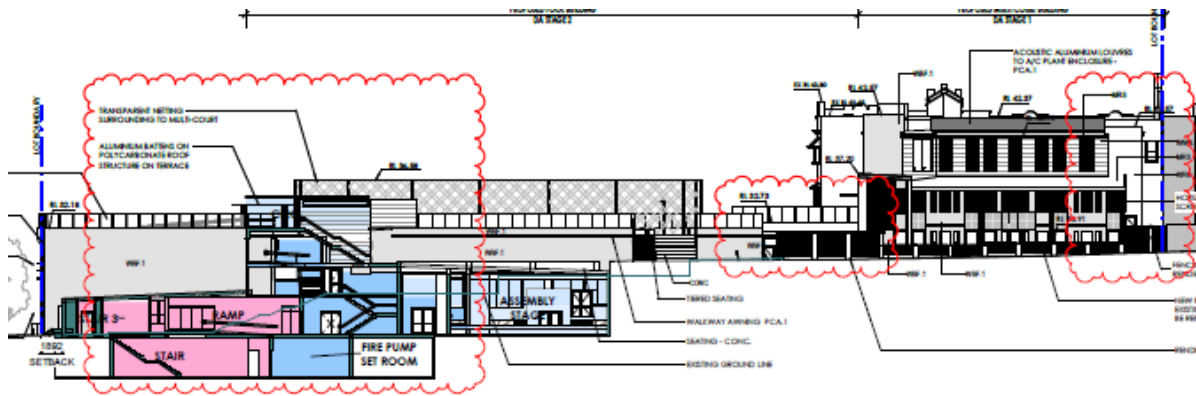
Proposed Elevation - Rockwall Lane (Southern Elevation)
